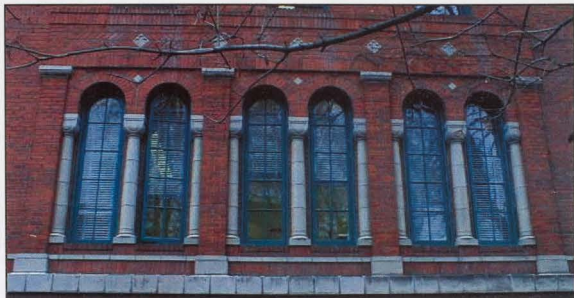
VERTICALLY HINGED, WOODEN SASH WINDOWS WITH BRICK ARCHED HEADERS, LOCATED ON THE SOUTH ELEVATION.
